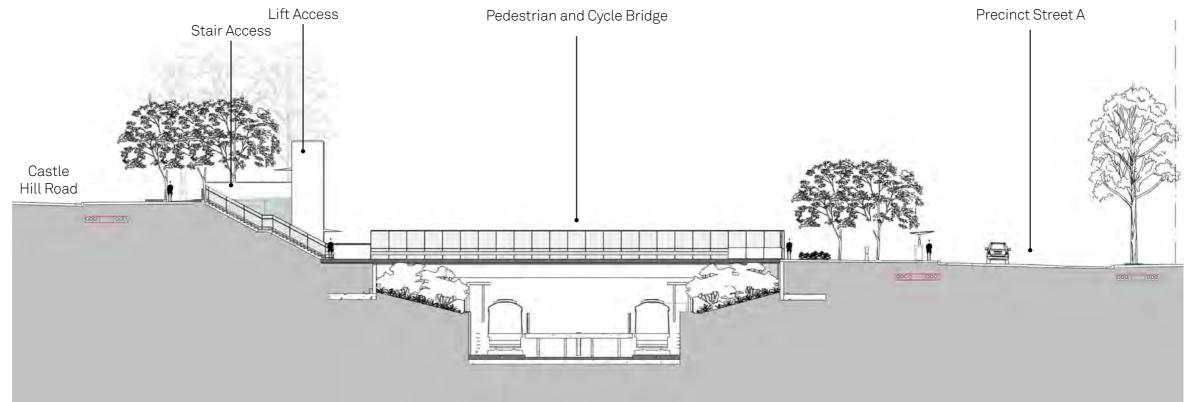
CHE\_Cherrybrook Station Pedestrian Bridge across Station cutting. Source: HASSELL.
